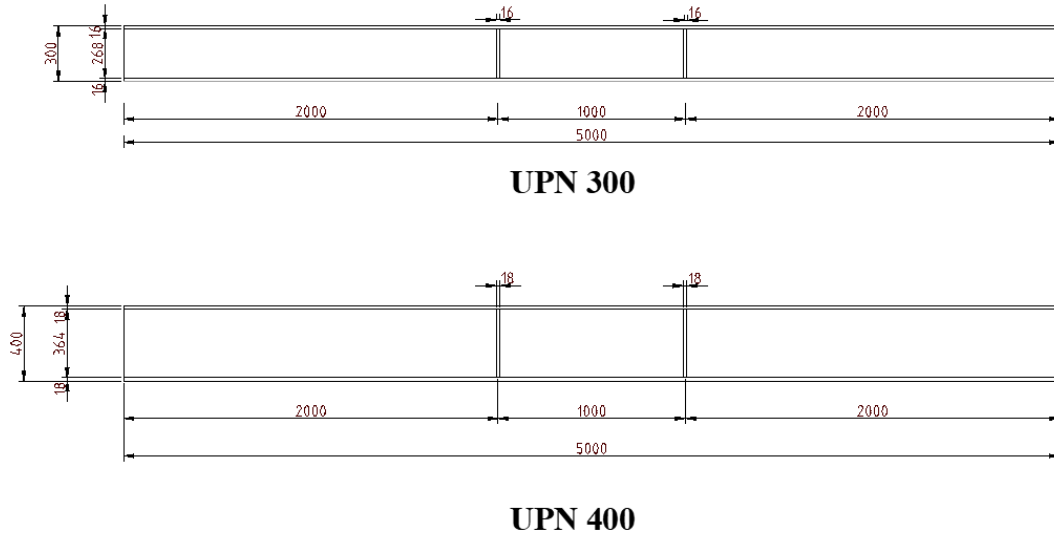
placing of the stiffeners on the UPN beam and the dimensions.
